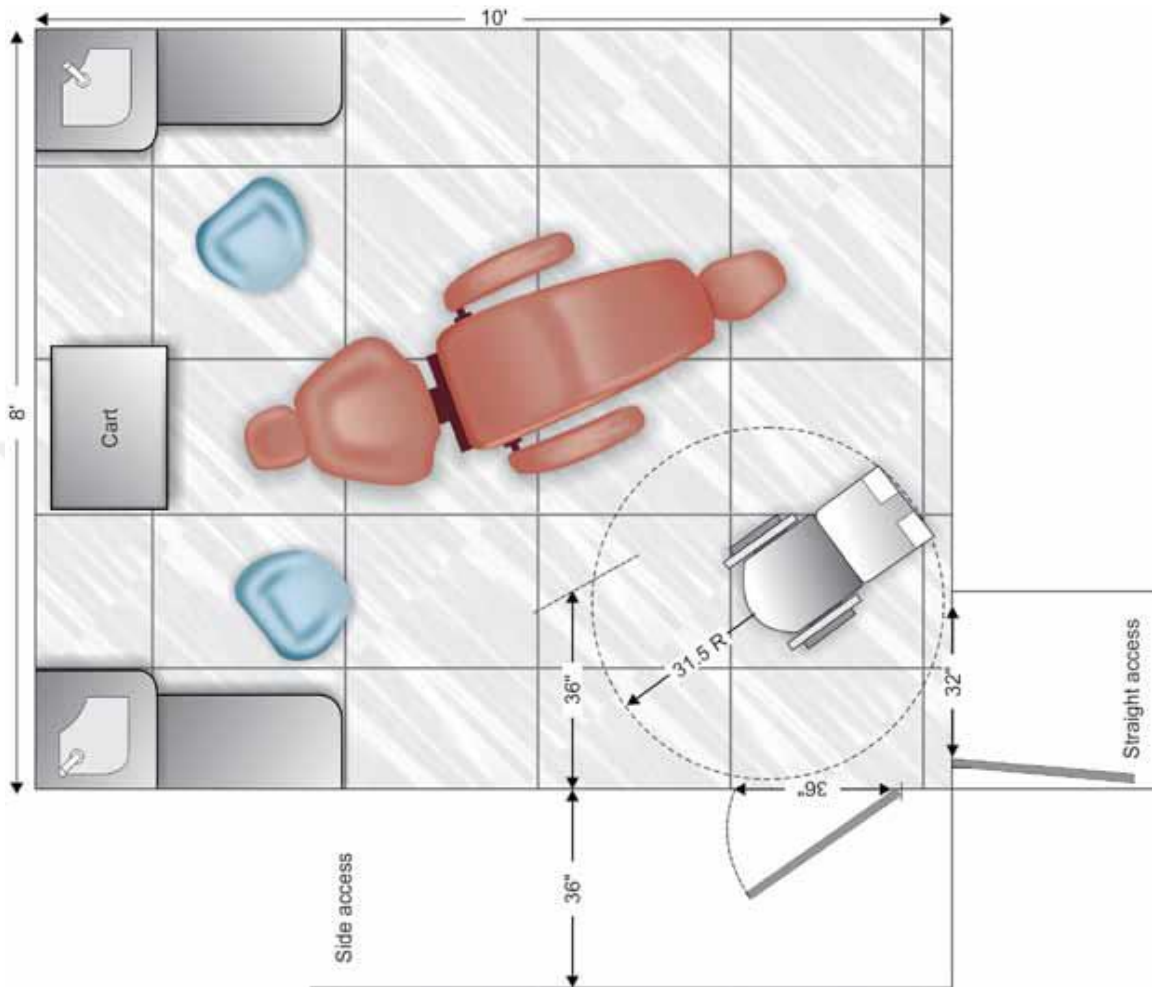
An accessible dental operatory floor plan designed for either a straight or side access doorway
